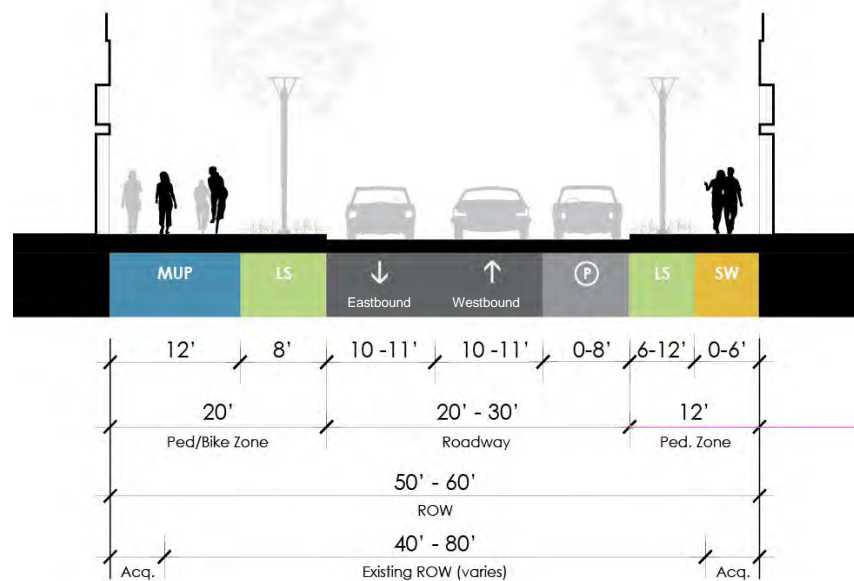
Retail Street Illustration 20th St NE (View Looking East to Main Street)
